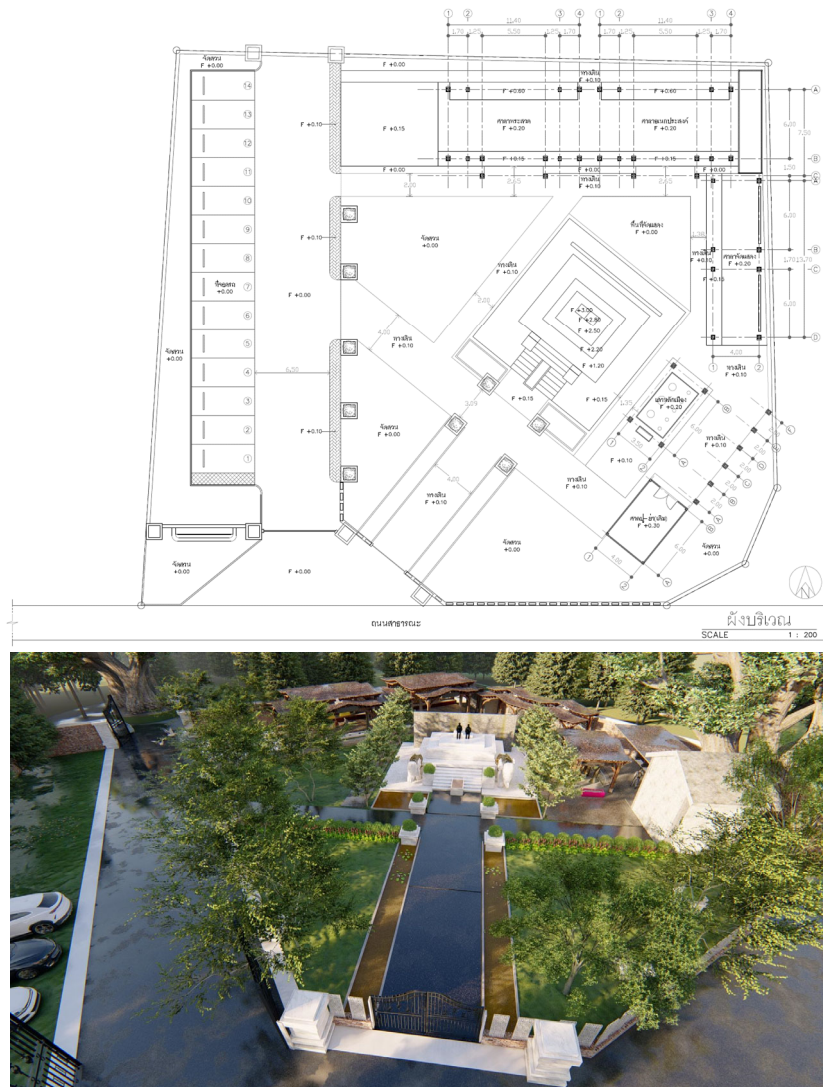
Drawing of master plan of the Tak city's pillar shrine (Above) and Bird-eye view perspective (Bottom)
